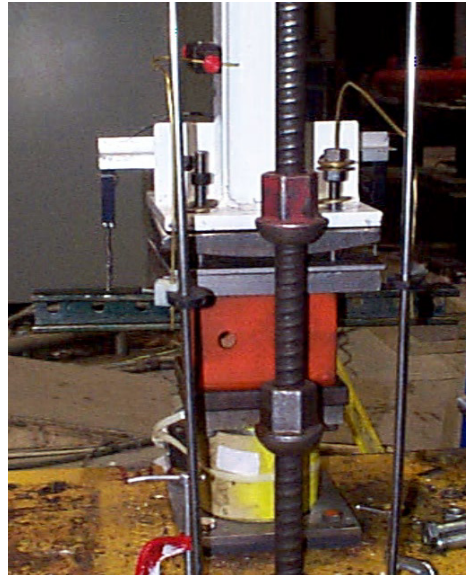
Instrumentation for Gravity Column Specimen (Bottom connection)
